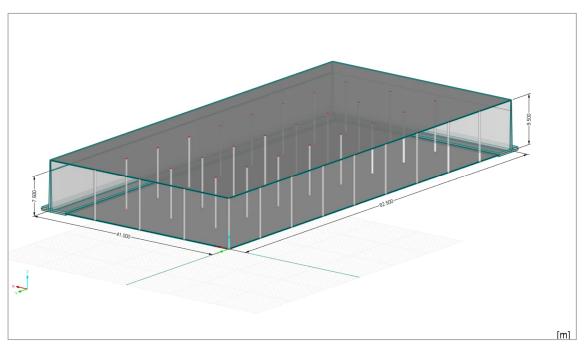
Type 2 - Conventional above ground rectangular reinforced concrete reservoir
